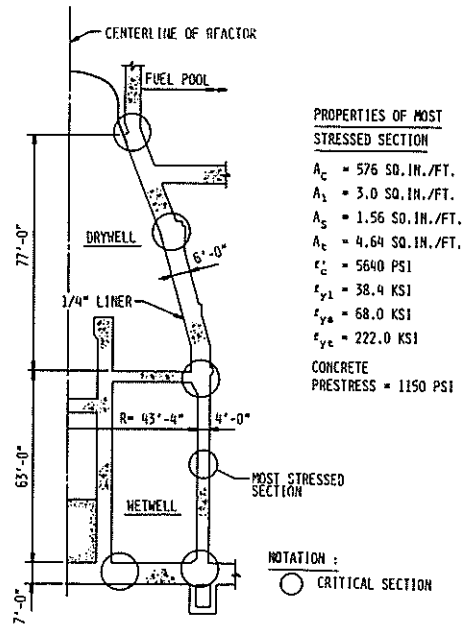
BWR MARK II PRESTRESSED CONCRETE CONTAINMENT
